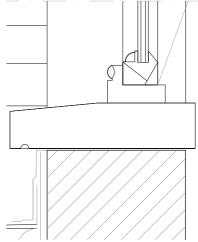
## DETAIL FOR THE PROPOSED CLERESTORY WINDOW; W-02-06.
